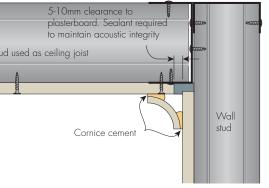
Non-Trafficable Ceiling to Masonry Wall
